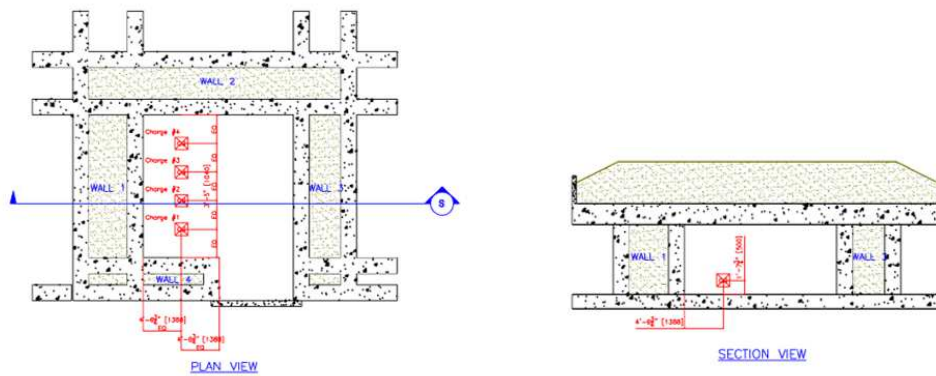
Plan view and section view of the test structure and placement of explosive charges for the test [10]
